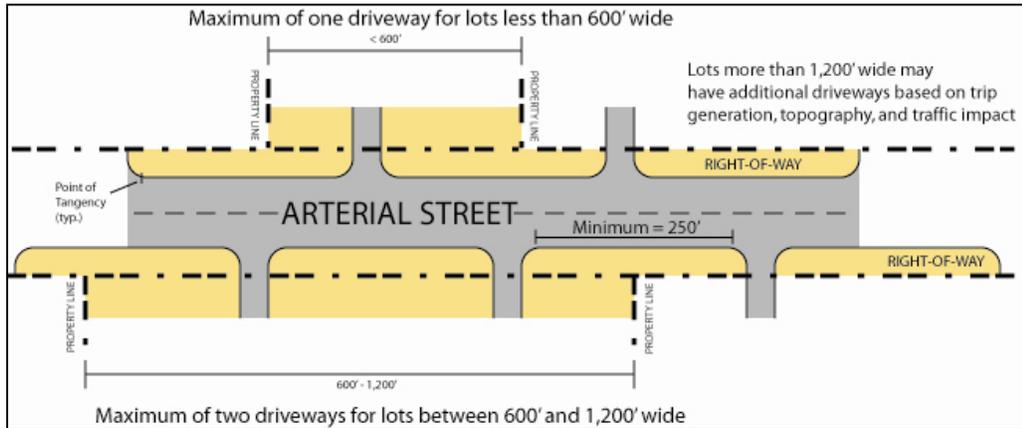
Regulating minimum driveway separation and sight distances will improve overall access control.
